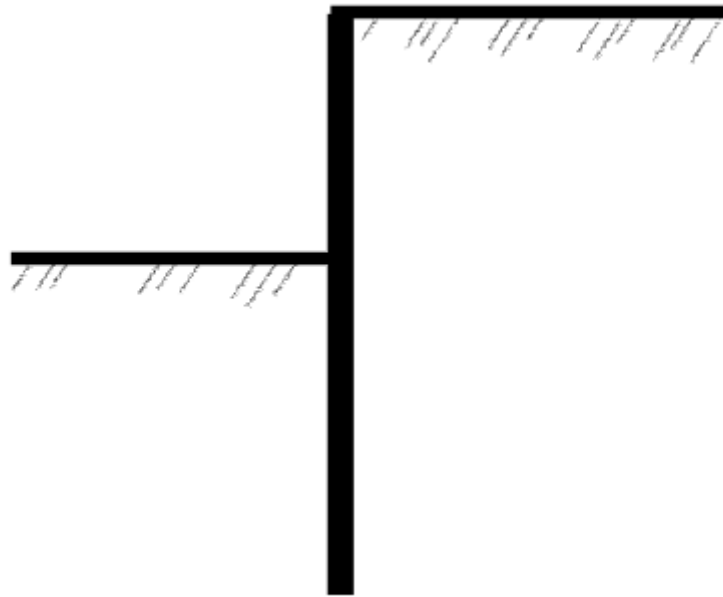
a cantilever sheet pile taken from handbook 016 page 10-3. illustrated by Yonas Tsighe
